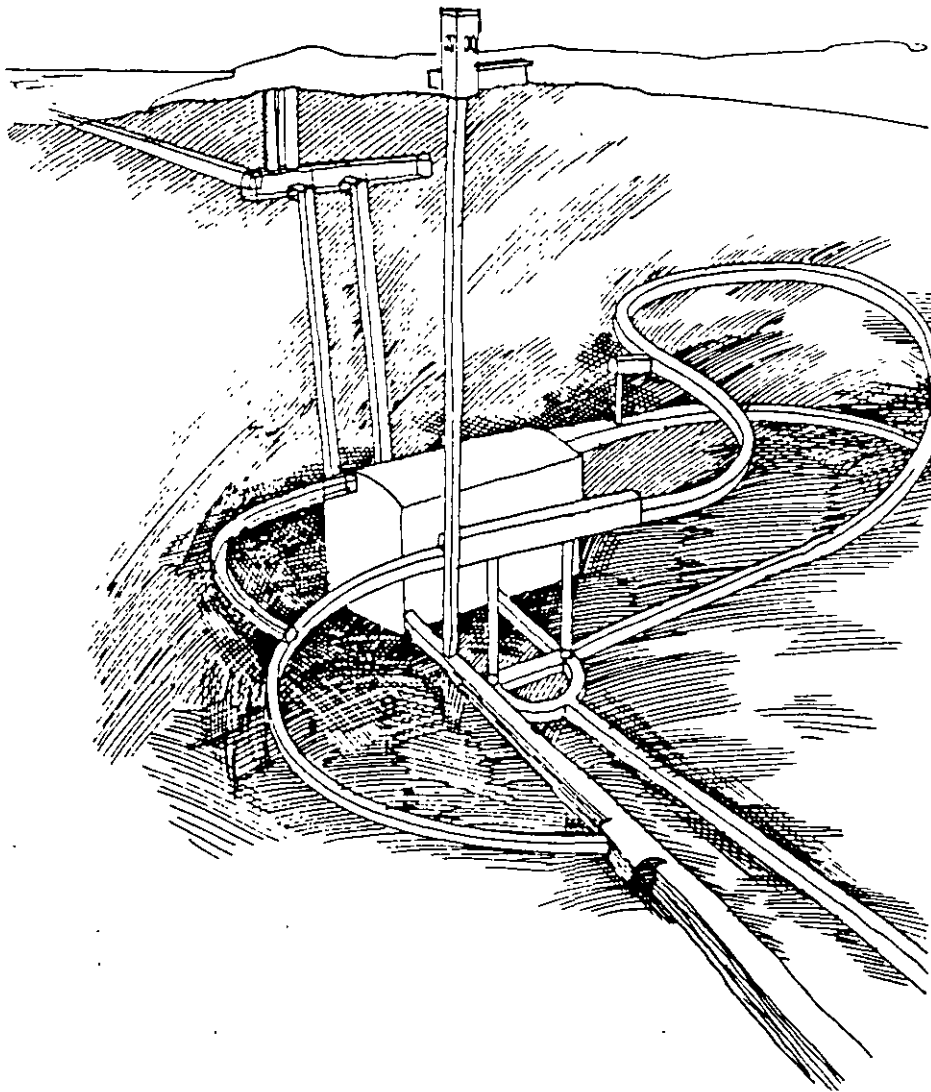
Typical tunnel system in a hydroelectric power plant.
